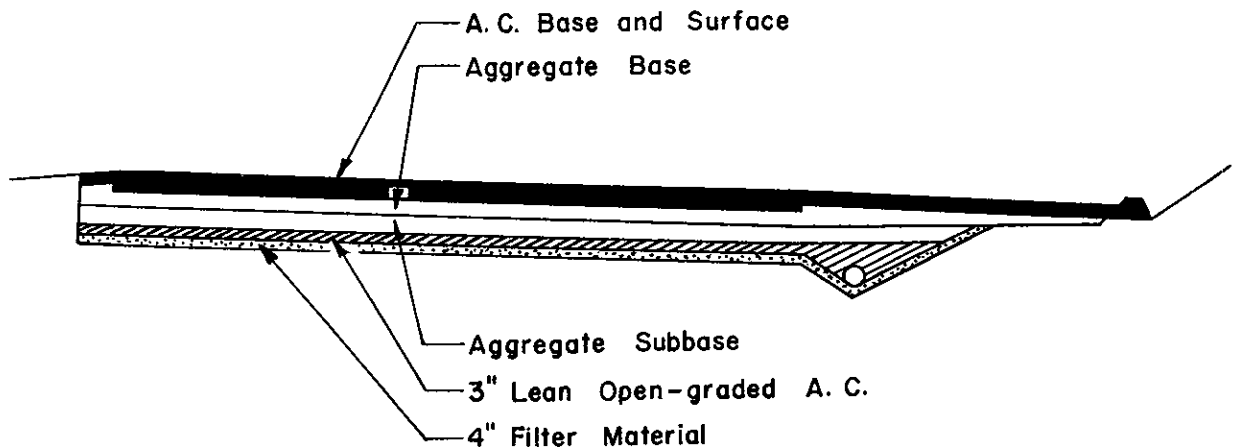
CROSS-SECTION SHOWING TWO-LAYER DRAINAGE SYSTEM.
